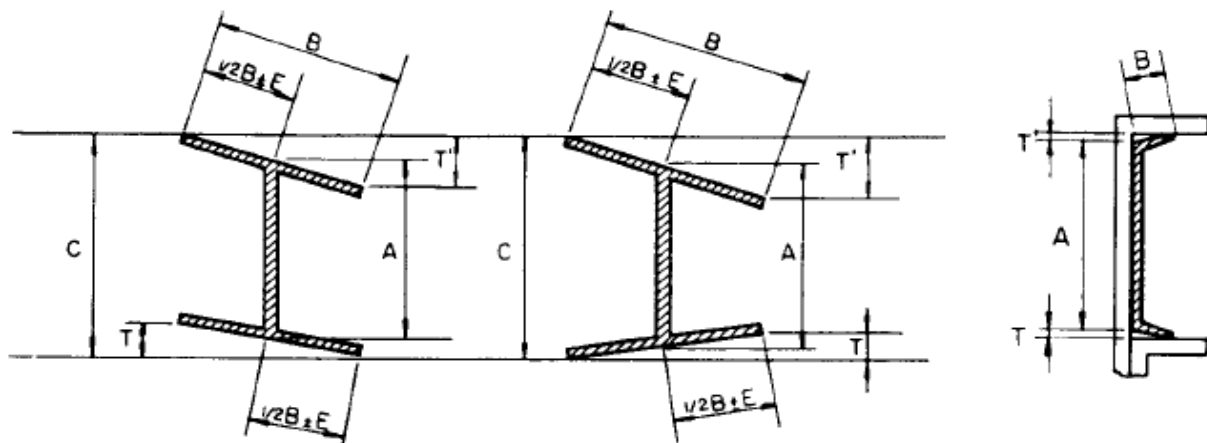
Mill tolerances on the cross-section of a W-shape.
